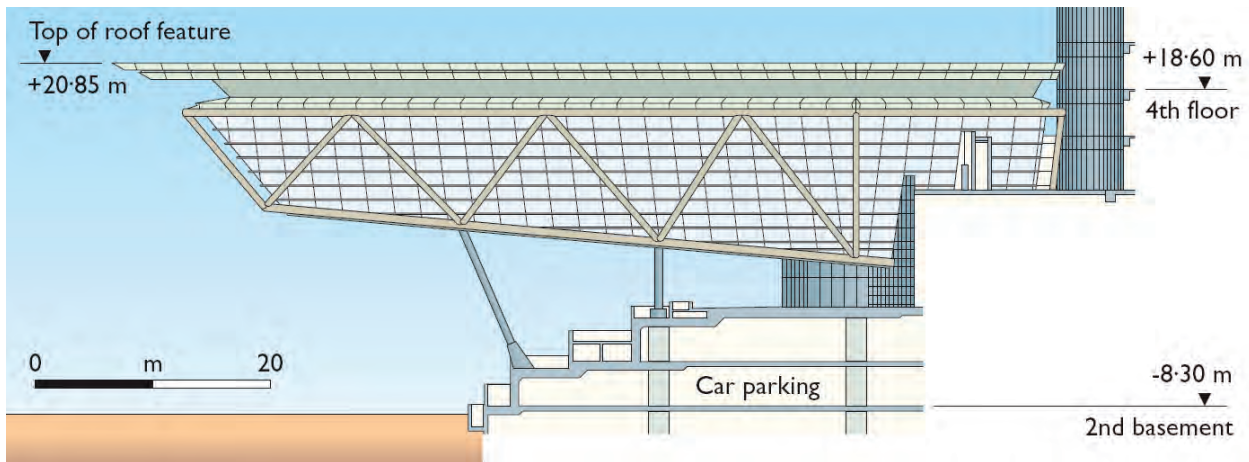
Elevation of diamond exchange centre overhanging cascading podium landscape
